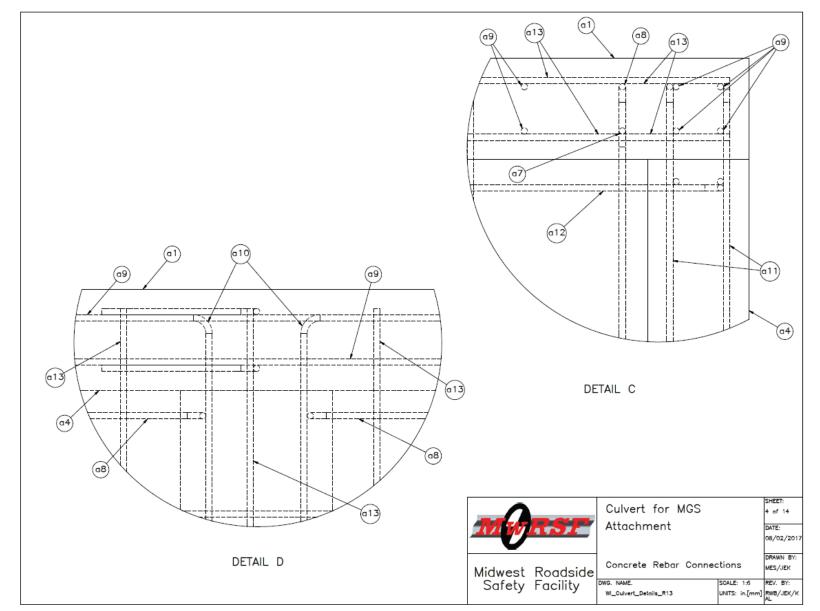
Concrete Rebar Connections (Cont.), Test Nos. CMGS-1 and CMGS-2
